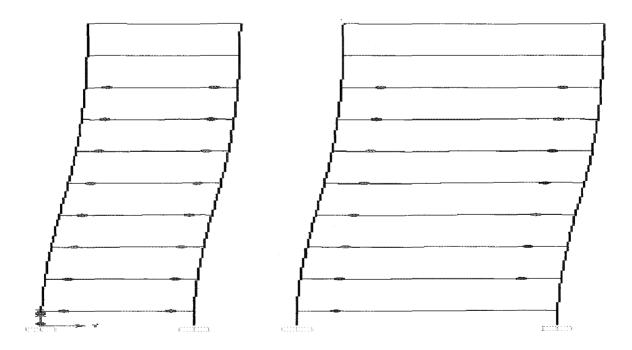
Yield Pattern at Ultimate Point for 9-Storey Building Designed for Gravity in Transverse Direction
